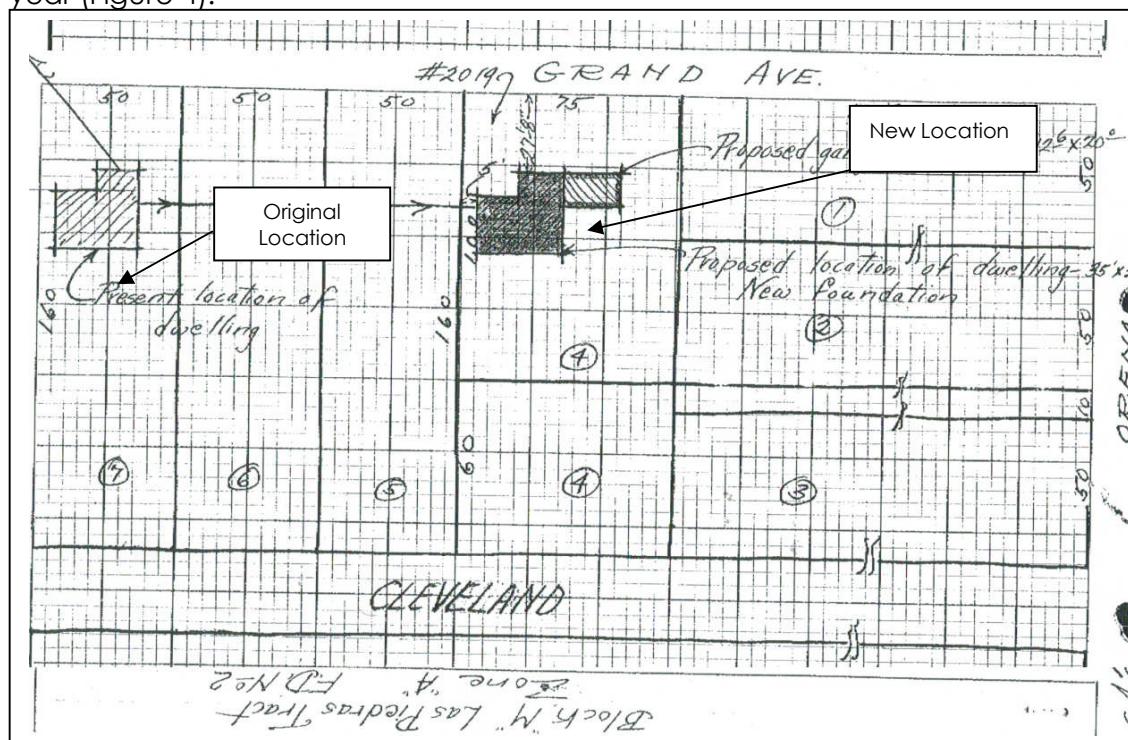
, Plot Plan from Permit A3037, May 5, 1927
